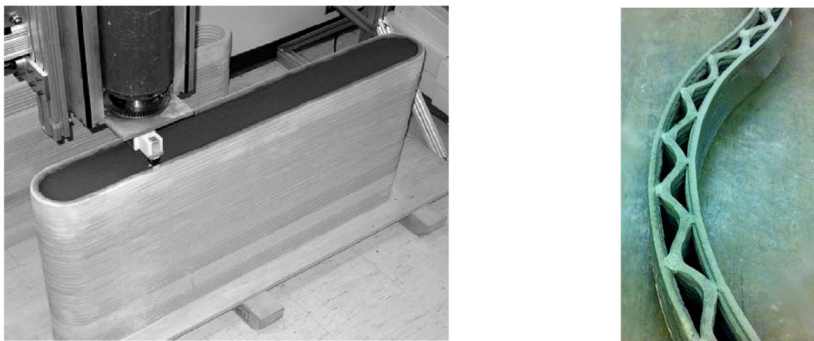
Wall sections build by contour crafting technique [21–23].
